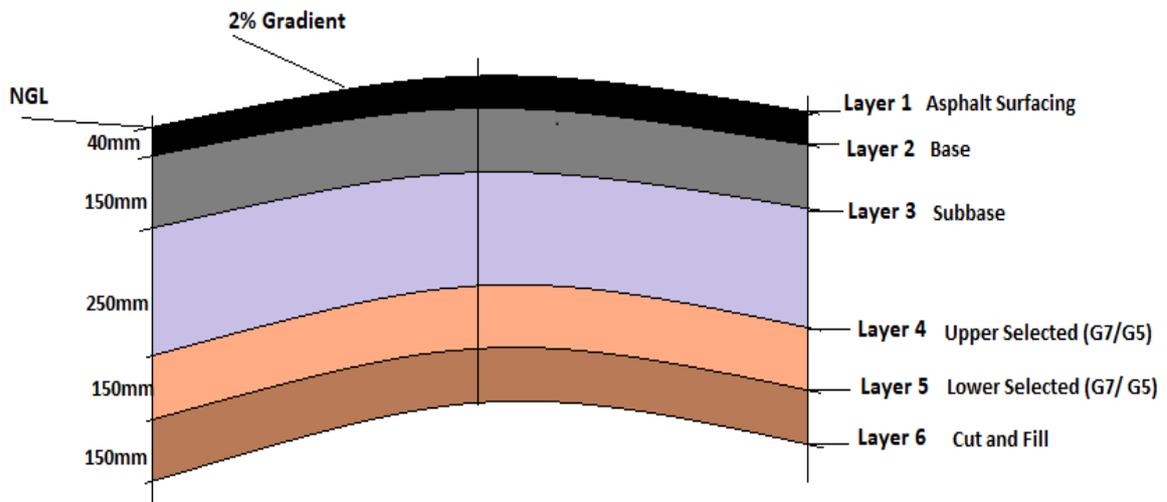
Cross-section: Typical road-paving design of roads in Bloemfontein
